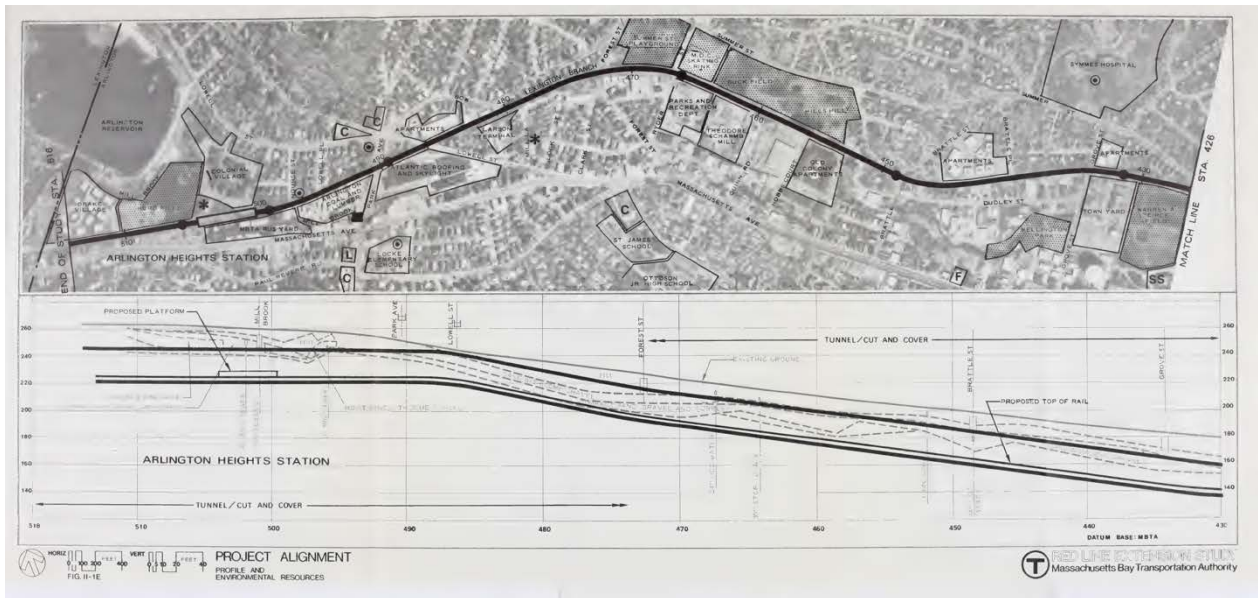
Arlington Center to Arlington Heights Track Alignment. *Source: EIS VII
